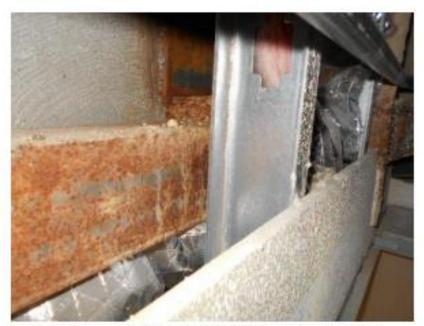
Representative view above the dropceiling, where the exterior precast panels tie into the steel bracing; typical surface rusting.
